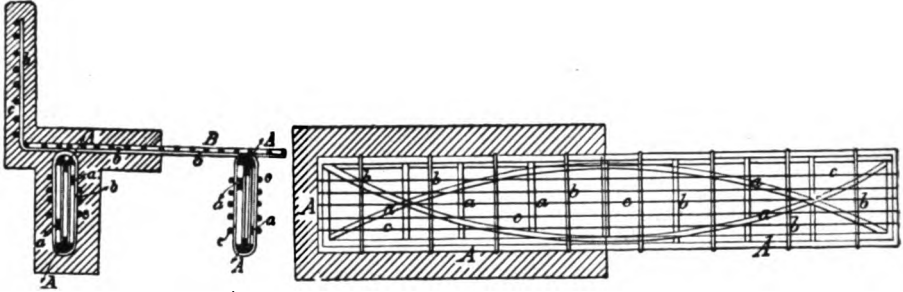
Monier's Reinforced Concrete Patent Drawings of 1878.
